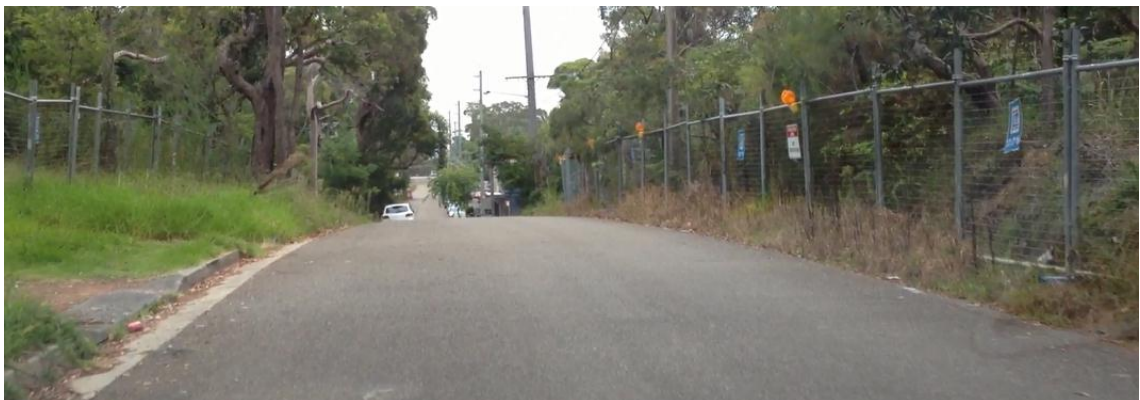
Bantry Bay Road looking south towards Warringah Road.
